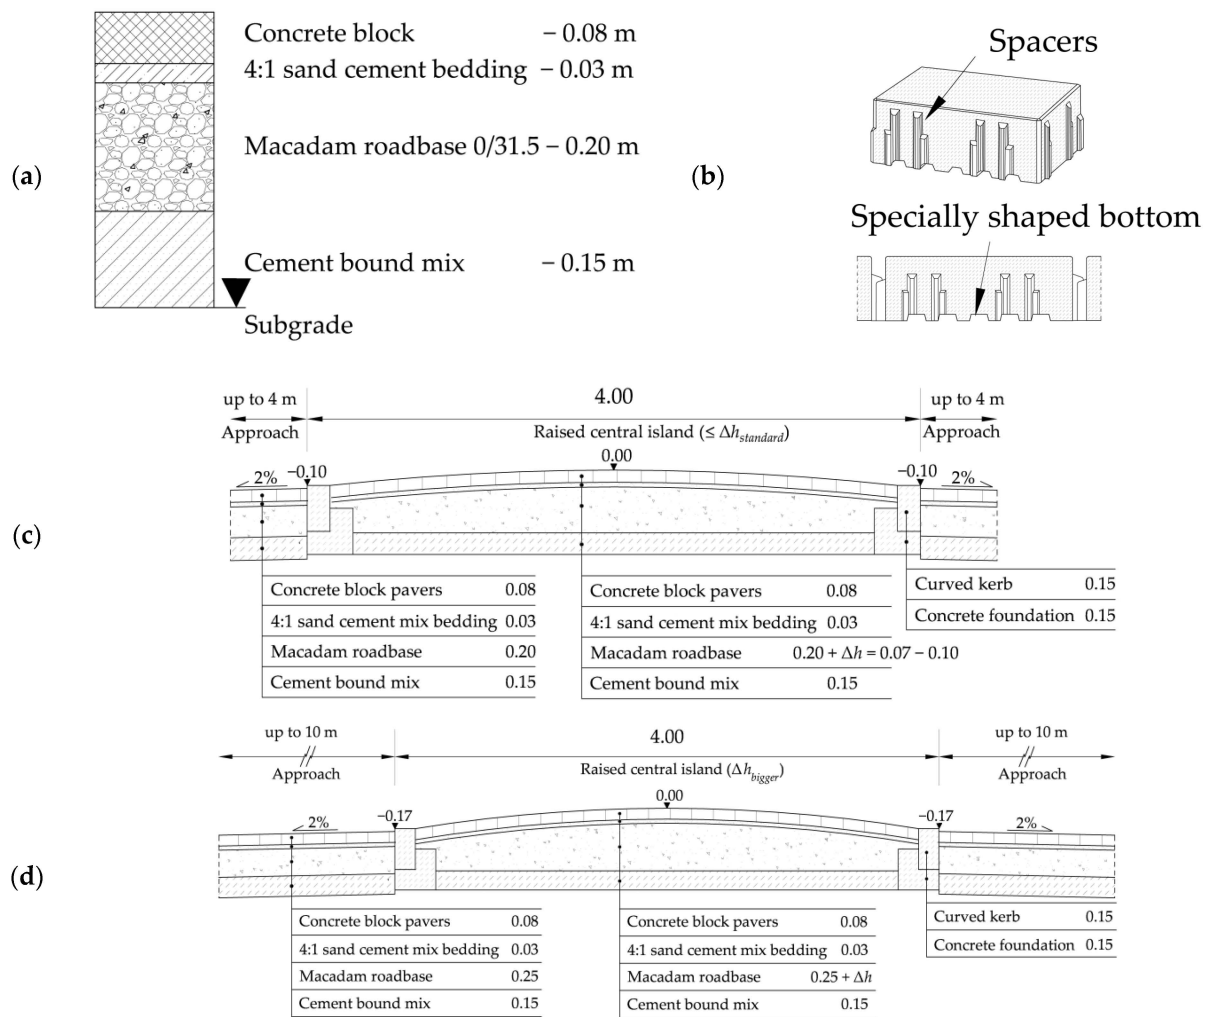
Road pavement design proposed for home zones including raised central island: (a) baseline pavement design for sections between traffic circles; (b) recommended concrete block pavers style; (c) pavement on raised central island of $\Delta h \leq \Delta h_{standard}$ (KR1 class); (d) pavement strengthening on account of increased traffic loading at $\Delta h > \Delta h_{standard}$ (KR2 class or thicker roadbase). Source: own work.
